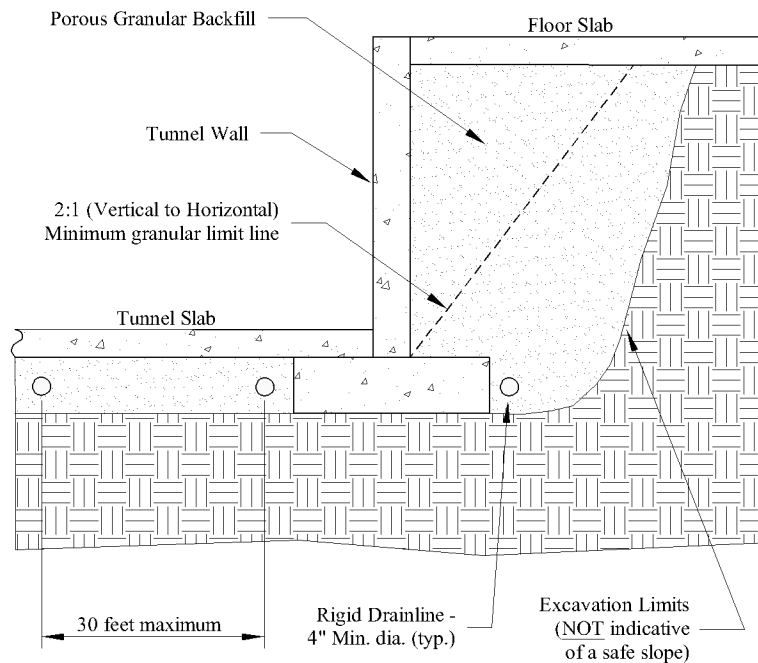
Typical Lateral Earth Pressure Section for Below Grade Tunnels
